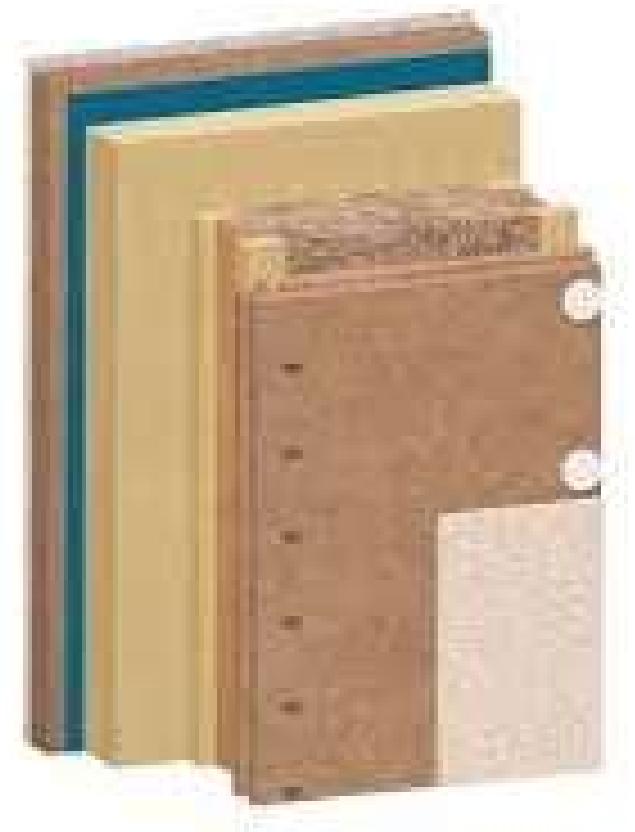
Installation of INTELLO® PLUS at wall sections
